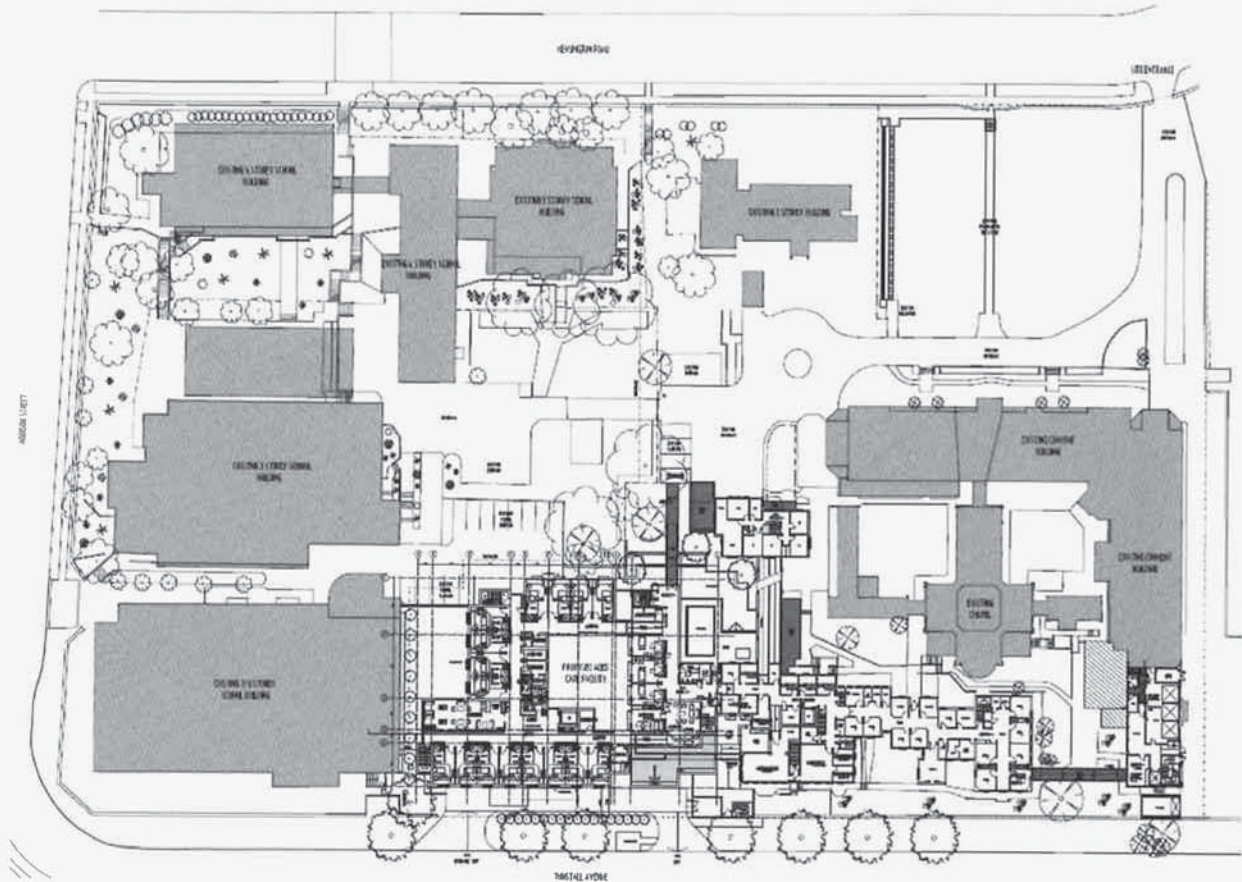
Proposed Concept Plan. Source: Urbis 2016
